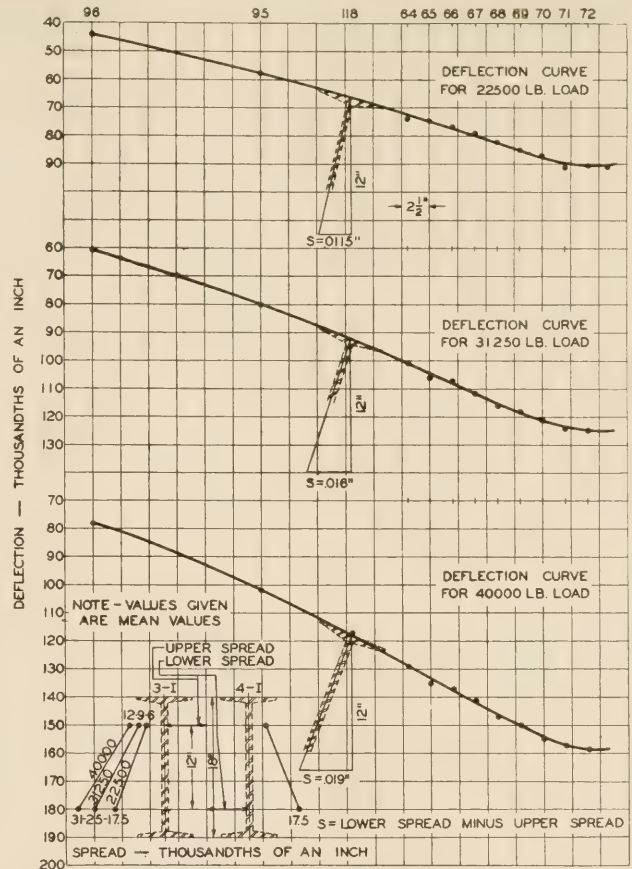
SKETCH SHOWING SPREAD OF TWO CENTER I BEAMS UNDER STATIC LOAD DURING TEST OF SECOND SLAB
